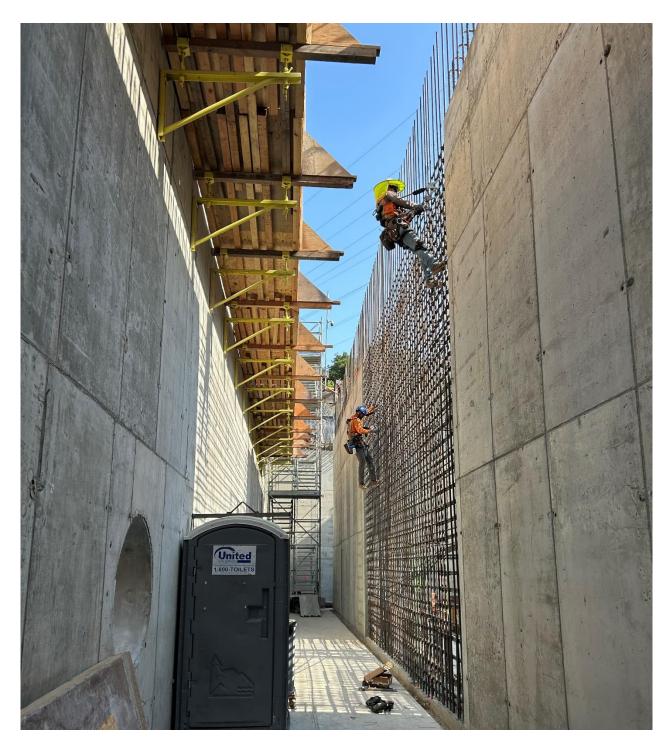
Ironworkers tying rebar for the second level CCB wall. The first level of the CCB is located below the concrete floor in the photo. The round portal in the left wall is the piping for water entering the CCB from the adjacent UV Room.
